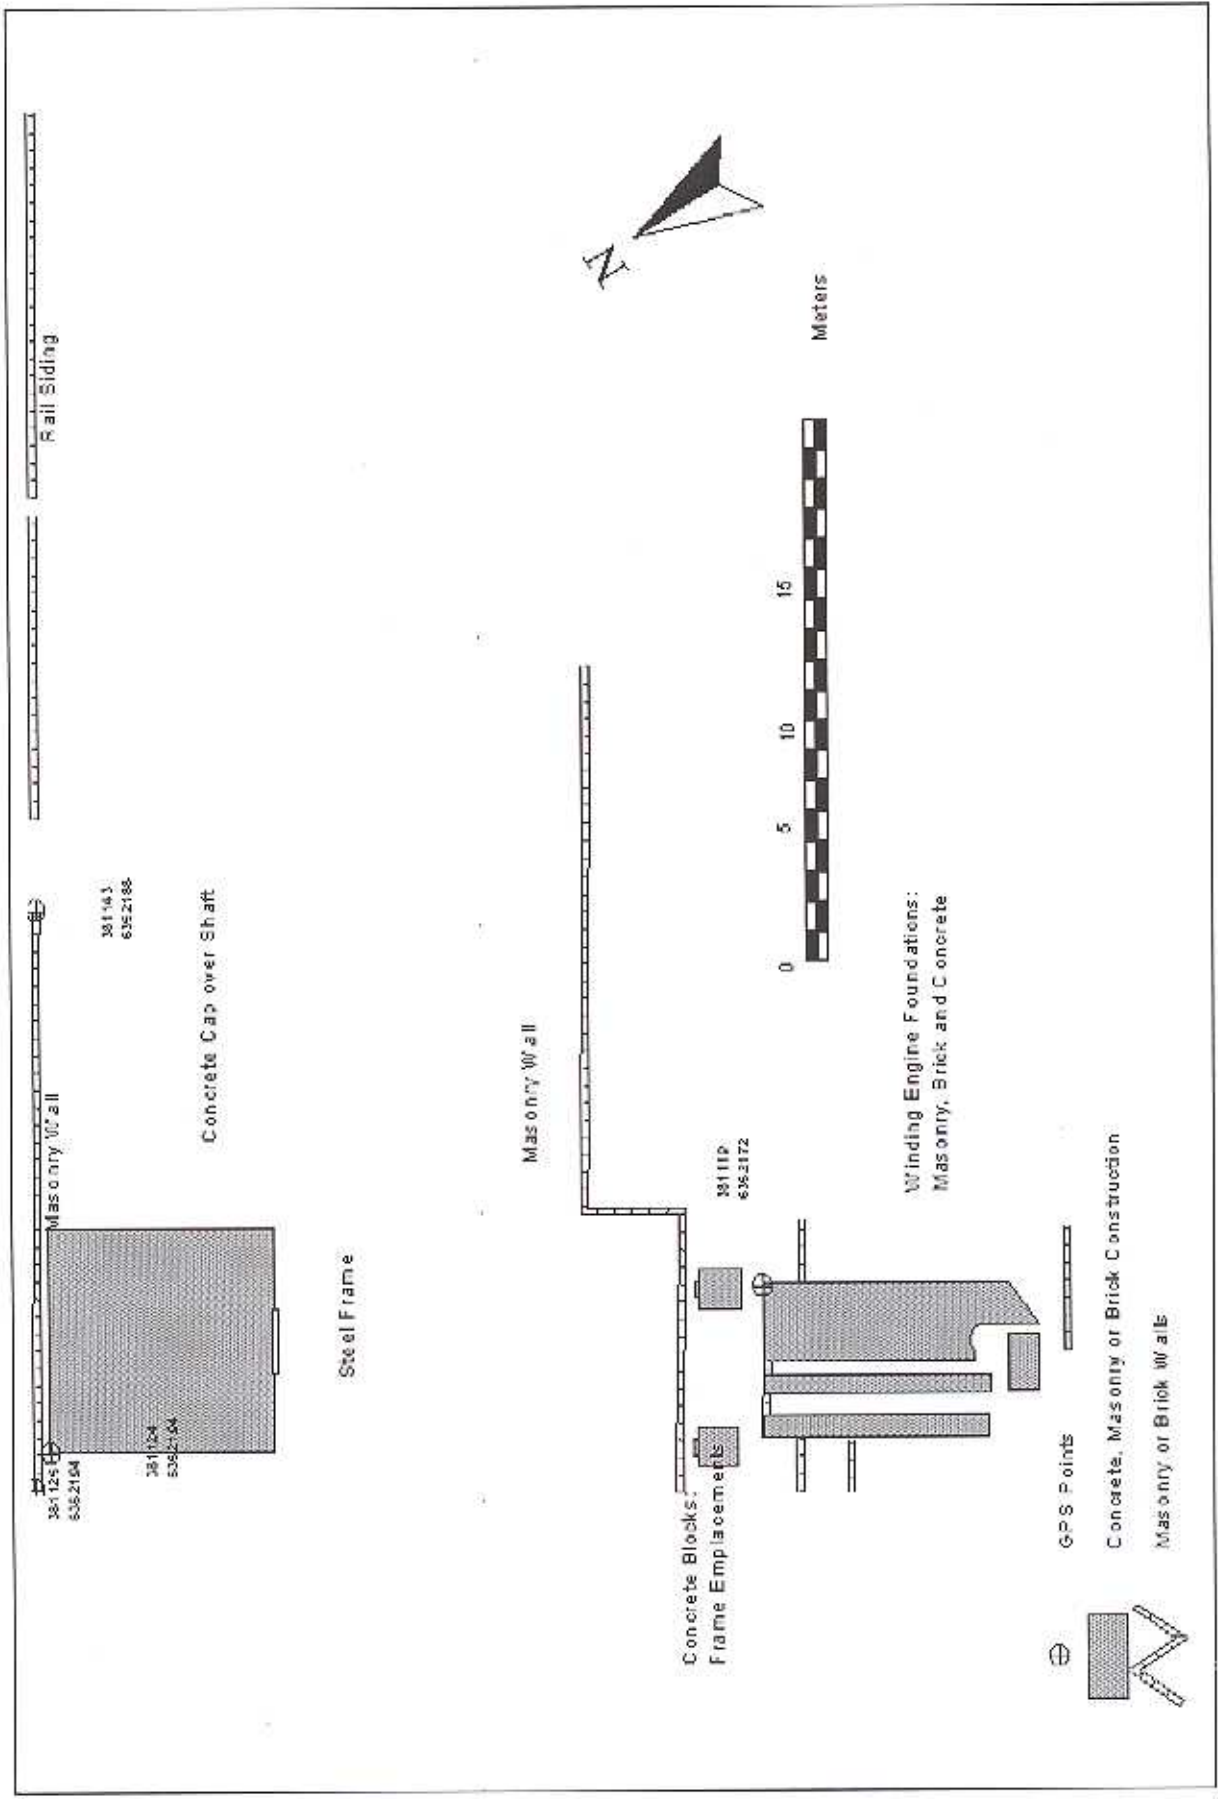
Old Burwood Colliery Site Plan, 20/02/02
